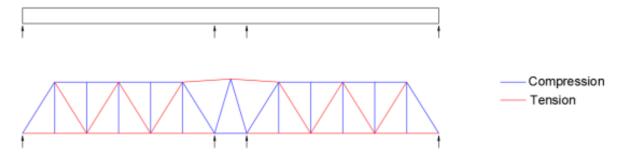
Swing bridge structural system (Anostructures, 2010)
